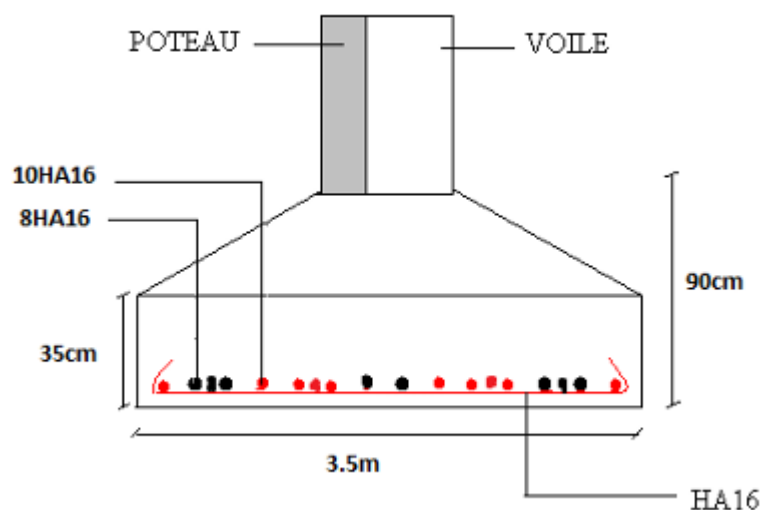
Diagram of reinforcement for the footing under the wall.
